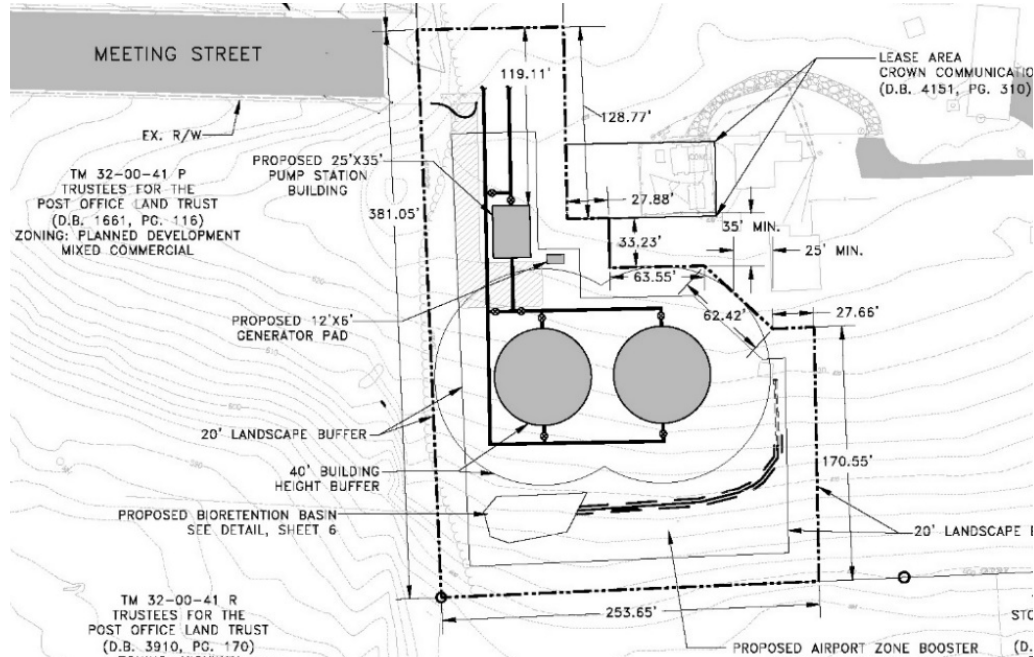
Airport Road Pump Station 2014 Conceptual Site Plan.
